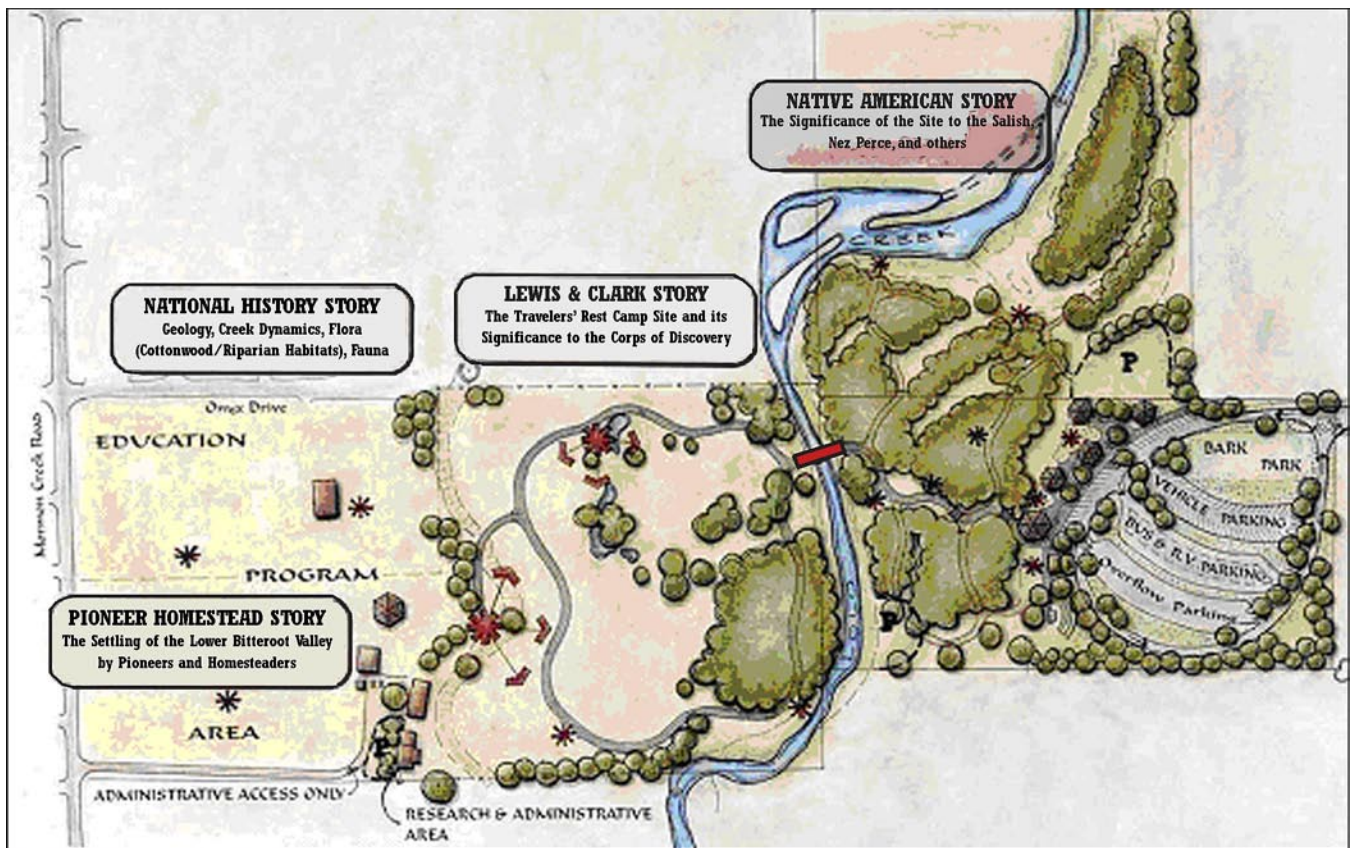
Conceptual master plan for Travelers' Rest State Park, Lolo, Montana.
